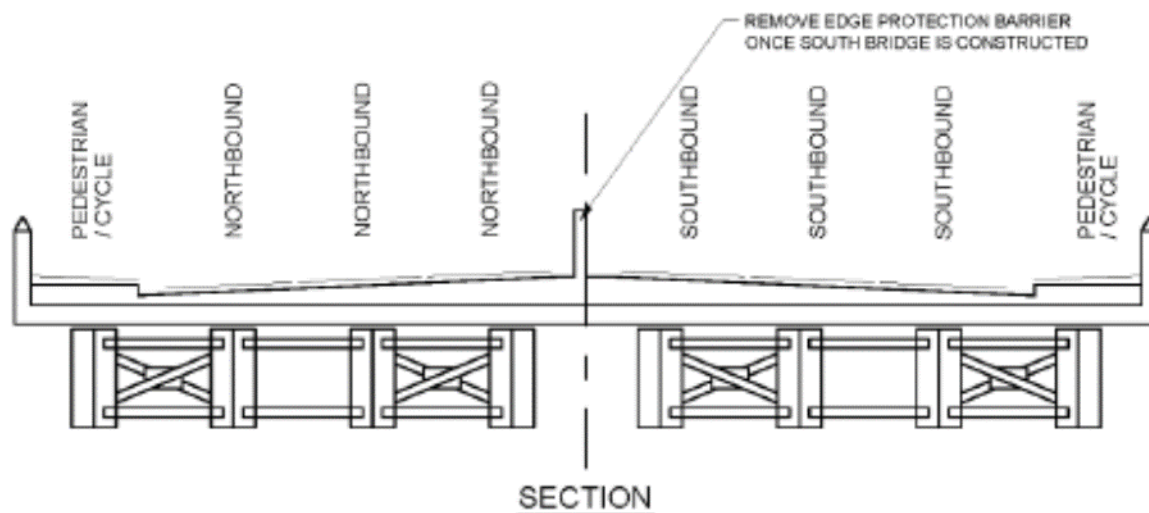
Step 4: construct new southbound bridge and open new HRB to traffic
